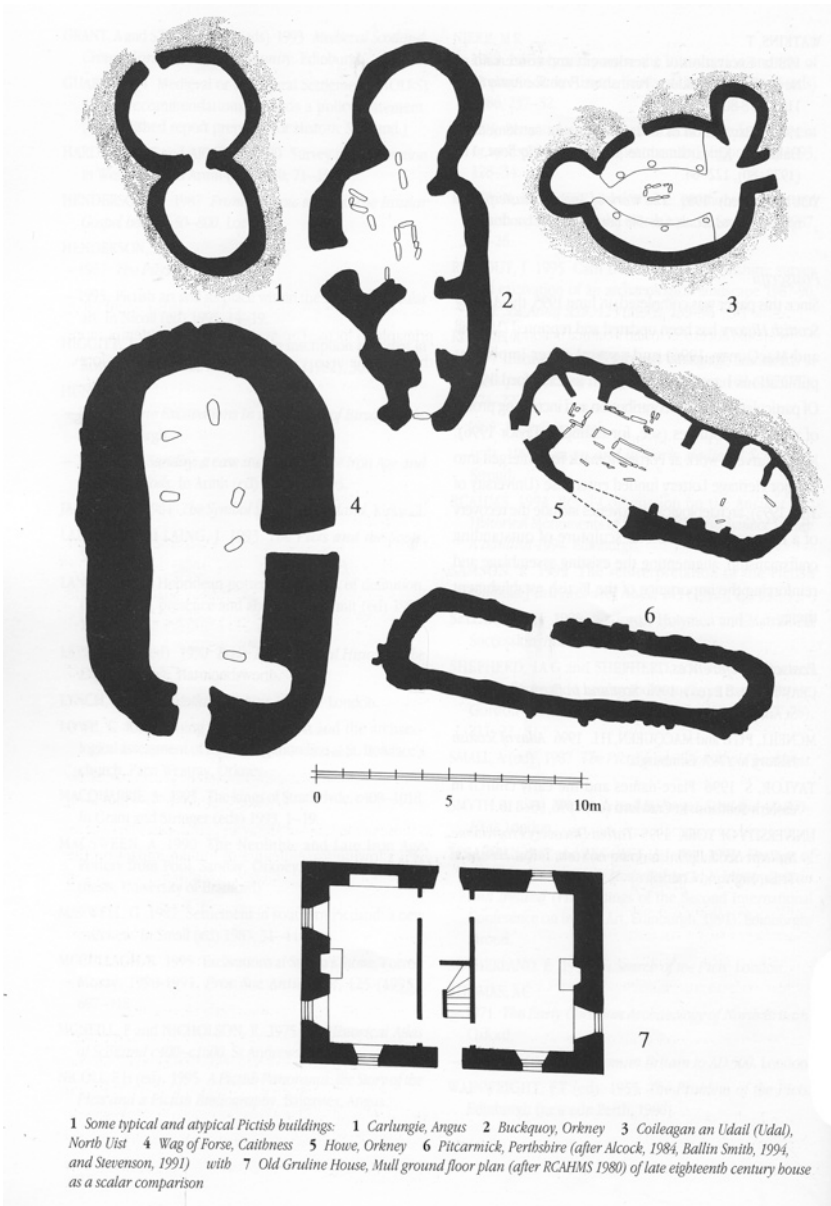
Plans of Pictish houses at a common scale showing the range of architectural traditions practised in the first millennium. (Ralston 1997, 18.)
